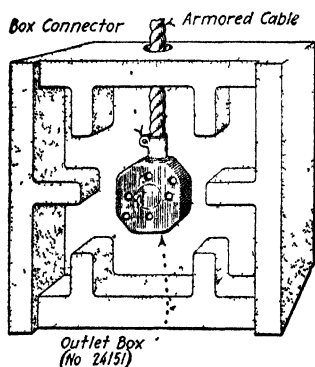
Rear view of tile showing outlet box and armored cable in position.
